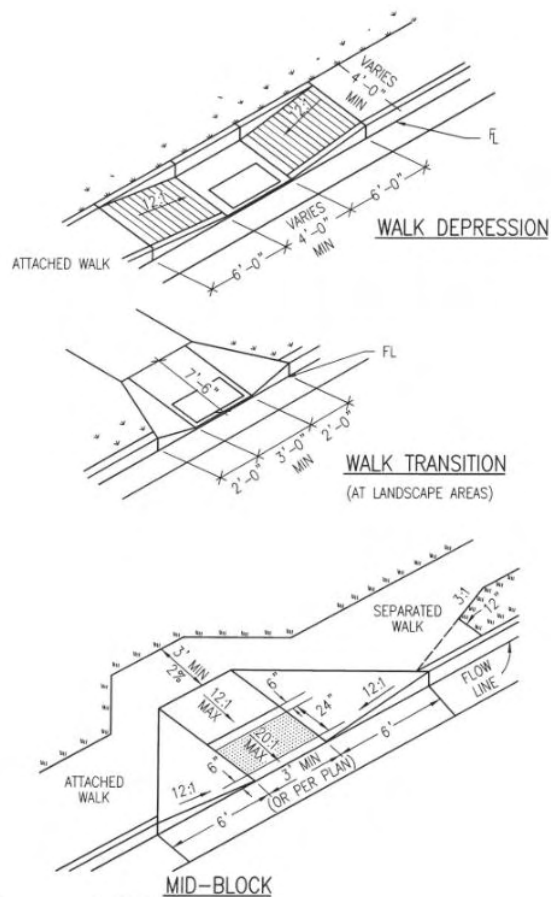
Typical curb ramp details. Image courtesy of the 2012 Standards and Specifications for Design and Construction.
